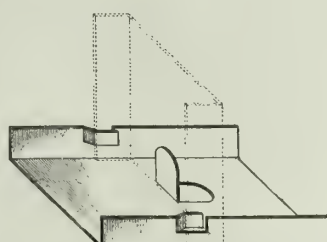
DETAIL SHOWING CONSTRUCTION OF DOOR JAMB FOR
